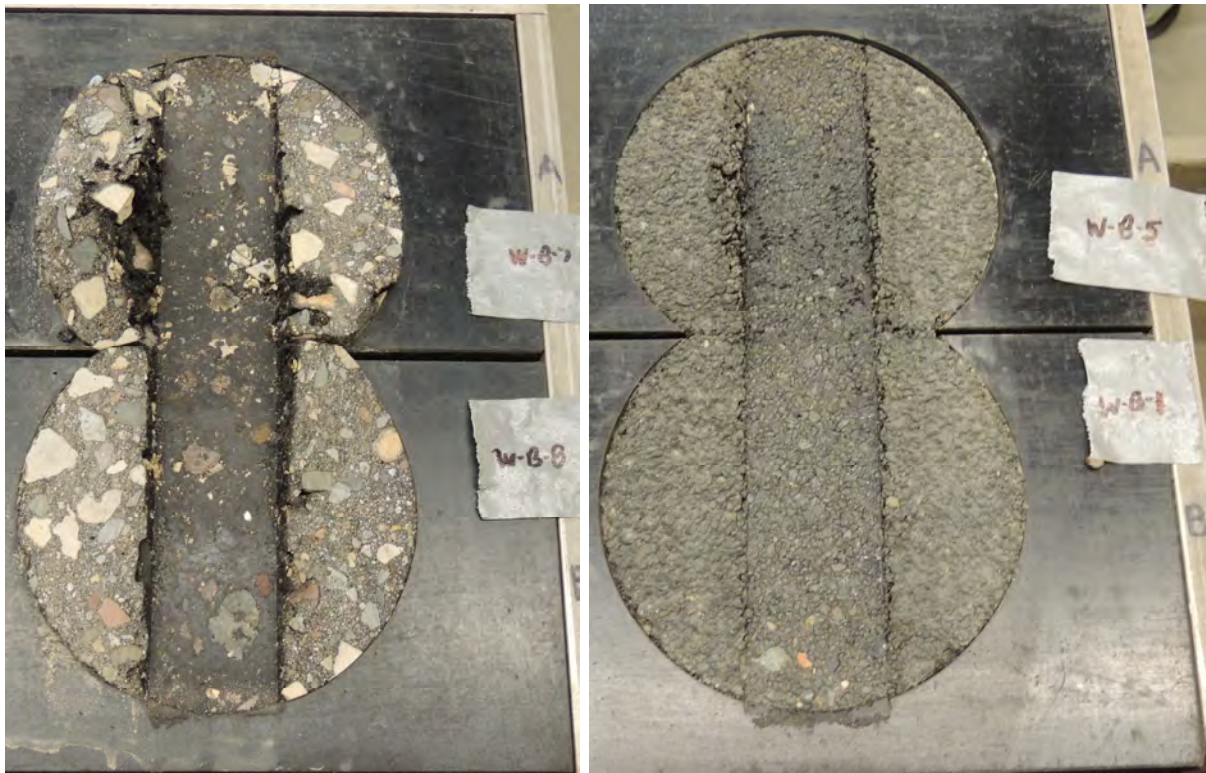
Paired specimens from Bridgewater Road in Woodbury, MN, after Hamburg test
